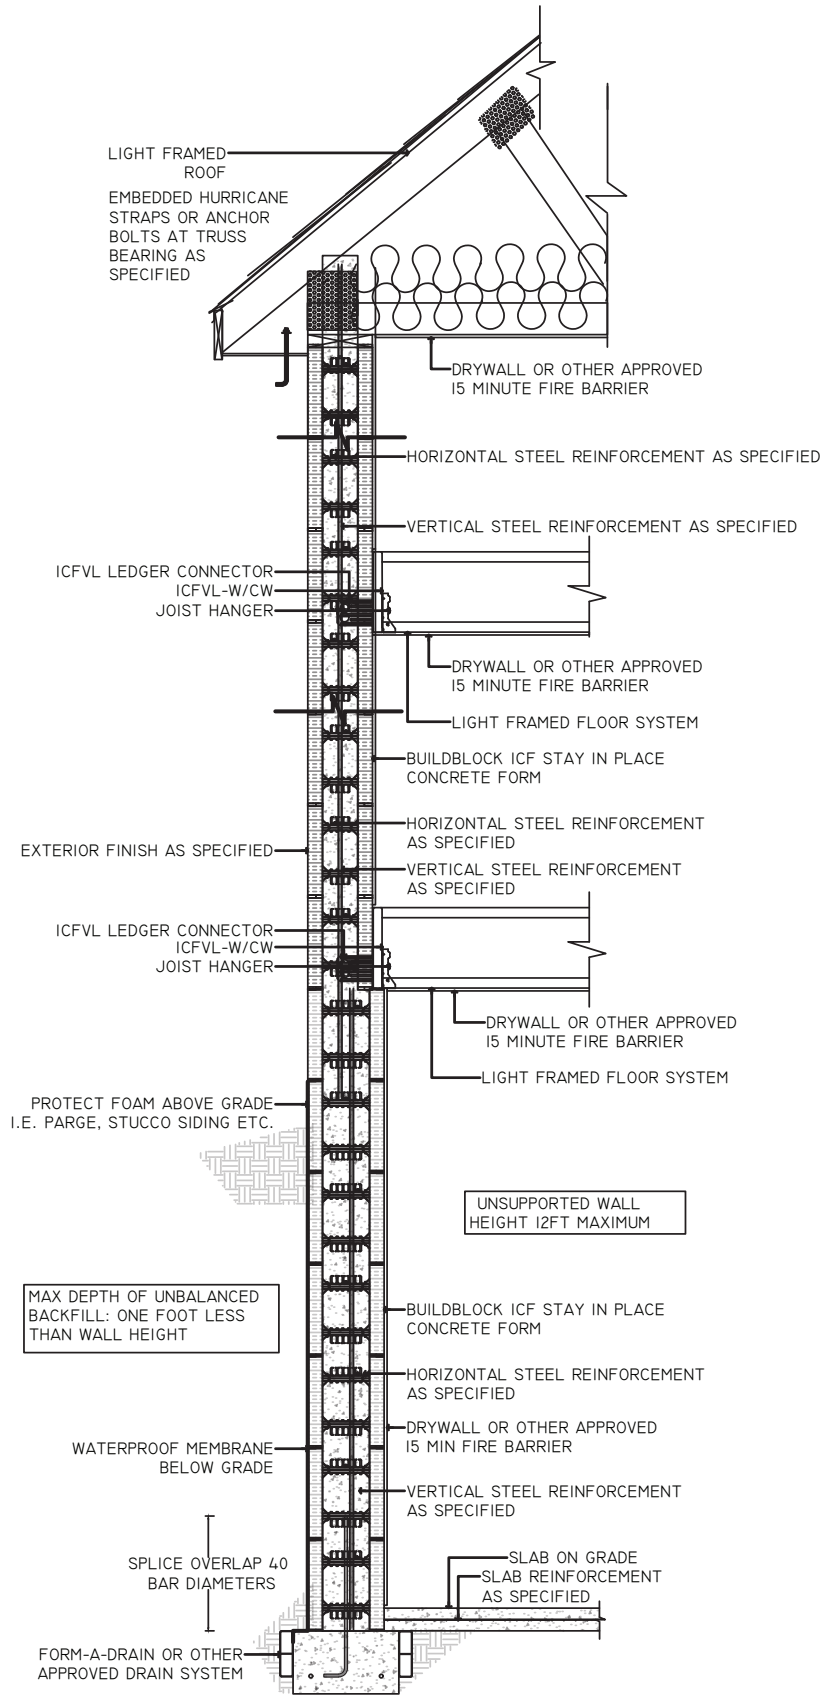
LOAD CASE 4. SECTION CUT THROUGH FLAT WALL OR VERTICAL CORE OF SCREEN GRID WALL. SUPPORTING 2 STORIES OF ICF WALL.
